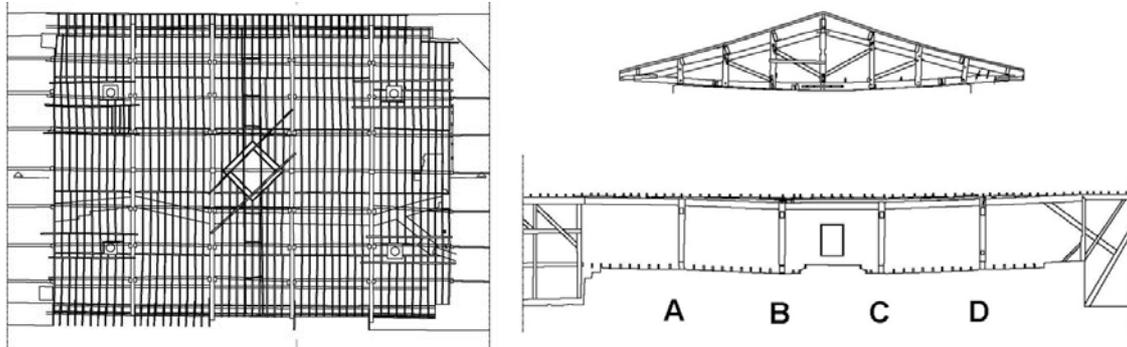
Plan and sections of the suspended truss over the General Assembly Hall [6].
